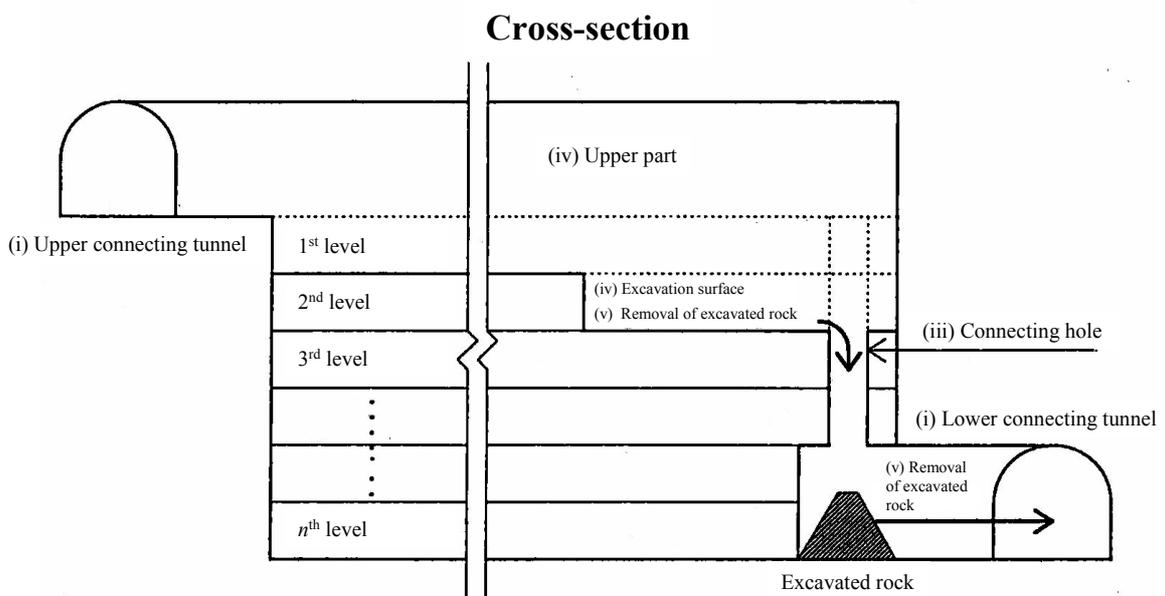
Concept for the excavation process of large disposal tunnels
